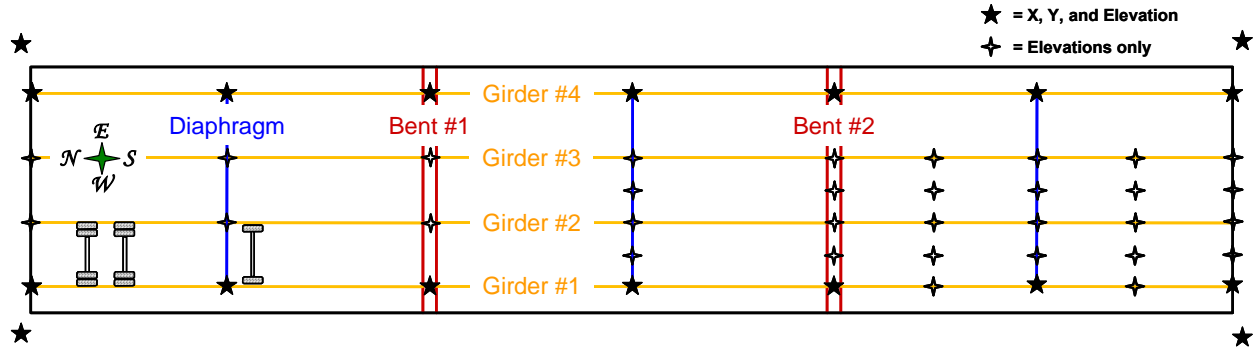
Survey Points Shown on Plan View of Bridge Deck
